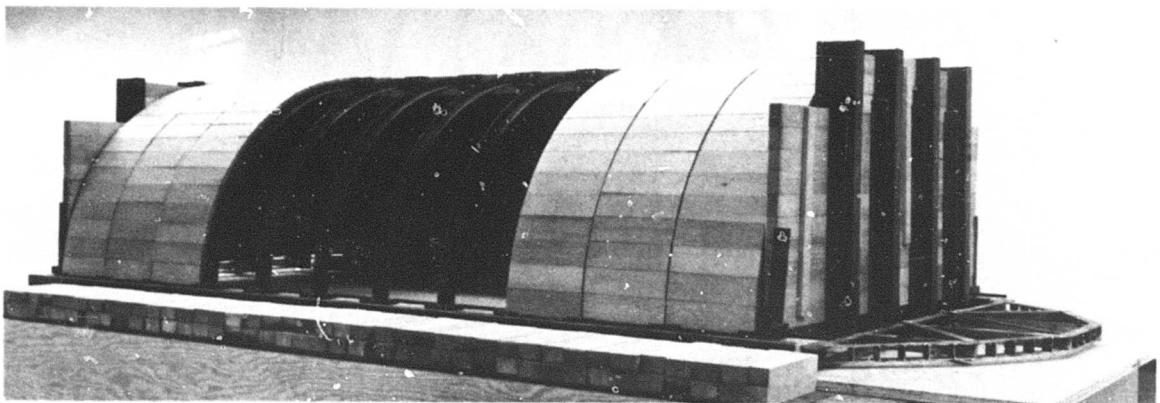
Steps in structure assembly (Sheet 1 of 2).
